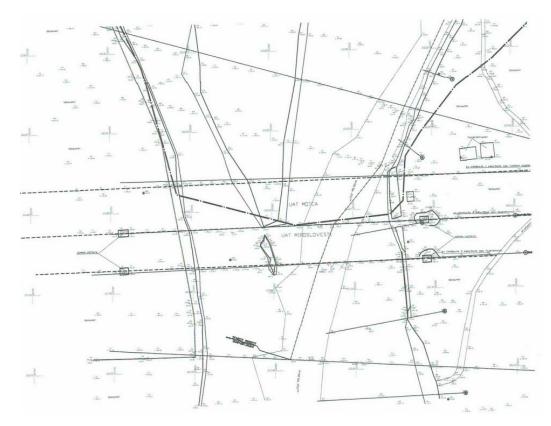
Topographic situation plan with the existing hydro-technical works in the site and positioning of the transverse and longitudinal profiles through the riverbed of Moldova
